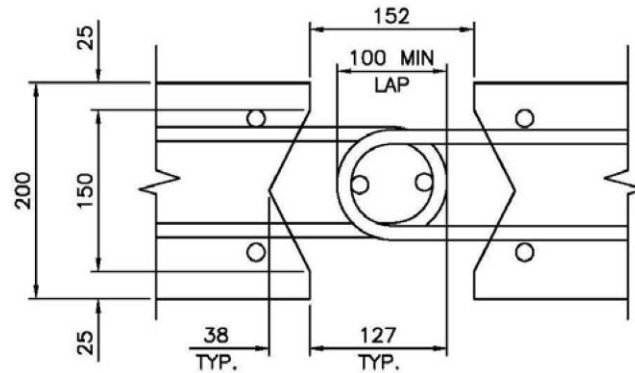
UHPC Joint Detail⁴ (Metric Units: mm)
